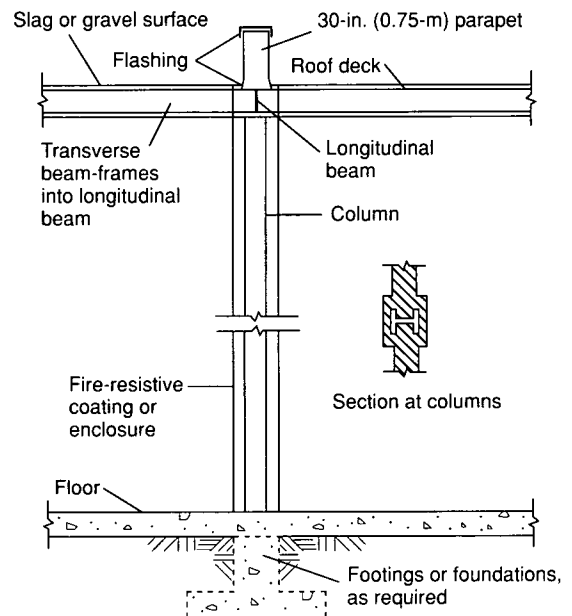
(a) Typical tied fire wall used with continuous building framework.
